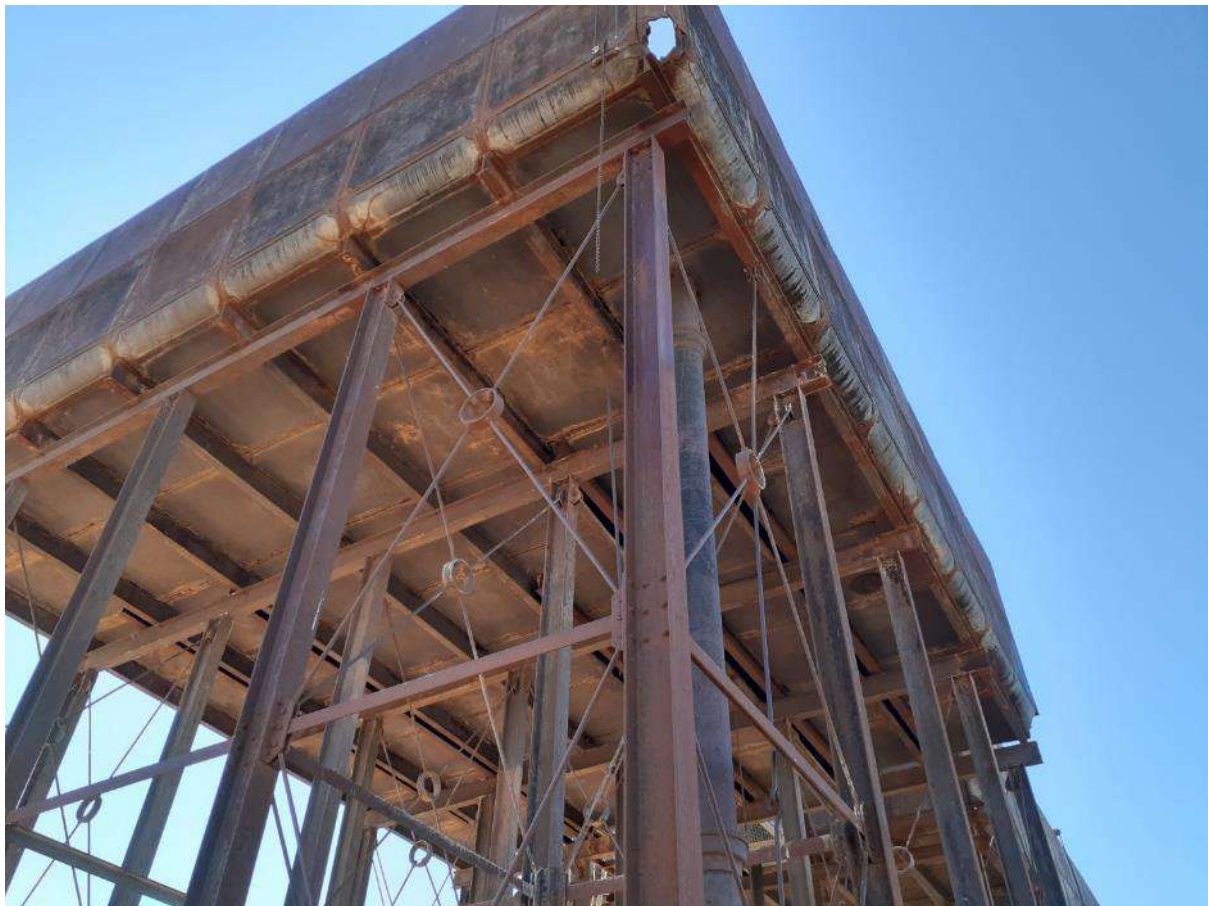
Replacement Joists installed beside corroded floor joists
